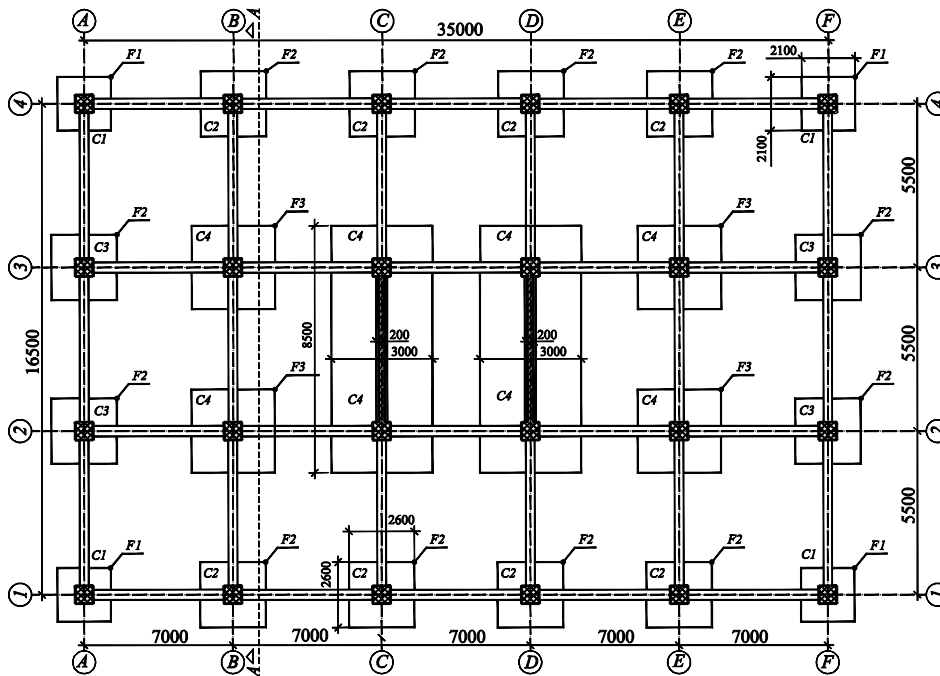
Formwork plan of the foundation structure of the prototype structure [12]
